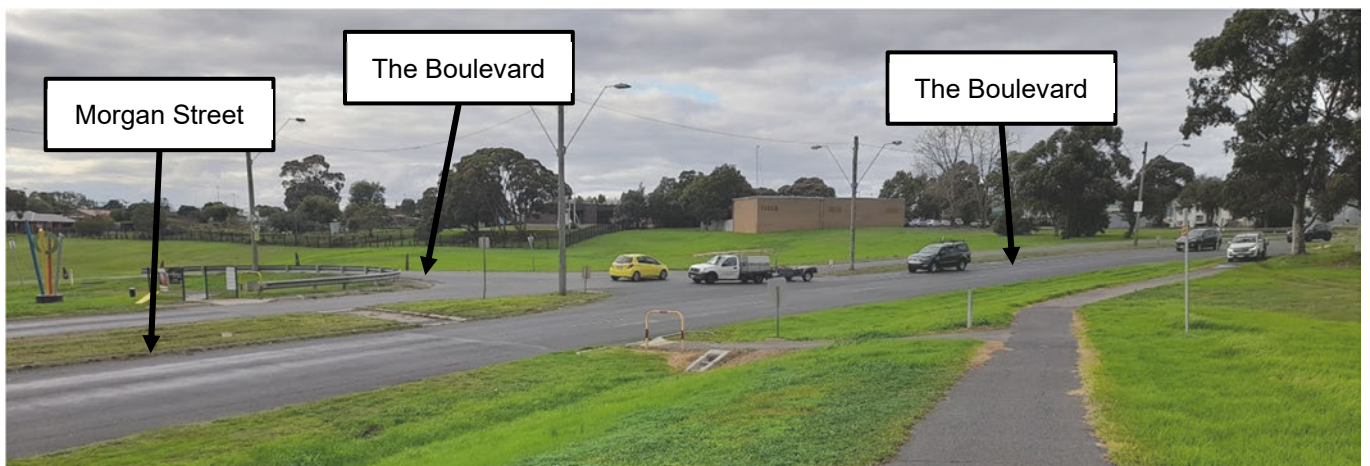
Morgan Street/The Boulevard intersection, looking north
